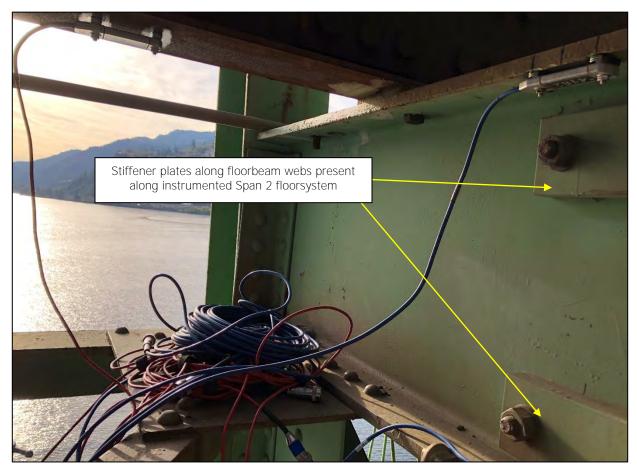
Photo of web stiffener plates along instrumented floorbeams
